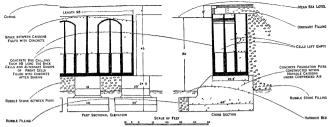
PRESIDENT WILSON BASIN MARSEILLES FR. QUAY WALL OF CONCRETE CAISSONS ON DISCONTINUOUS CONCRETE FOUNDATIONS IN DEEP WATER
